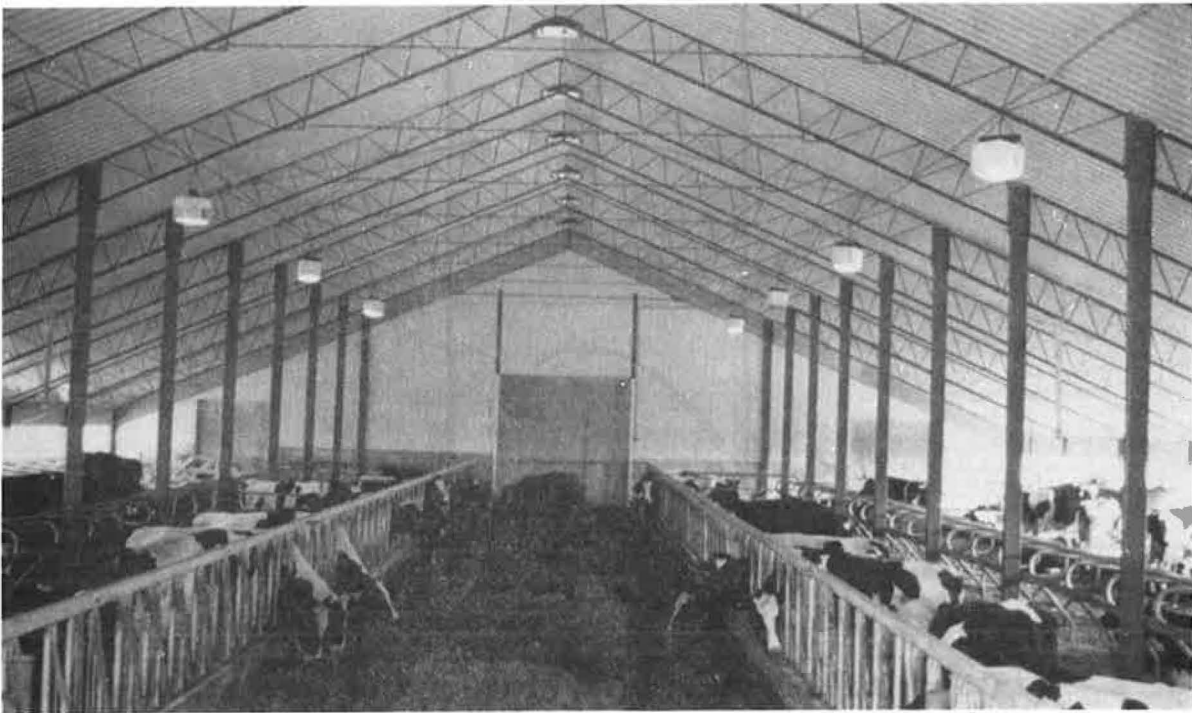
Natural ventilation will provide an excellent environment in this warm insulated steel-truss building with a sloped ceiling.
